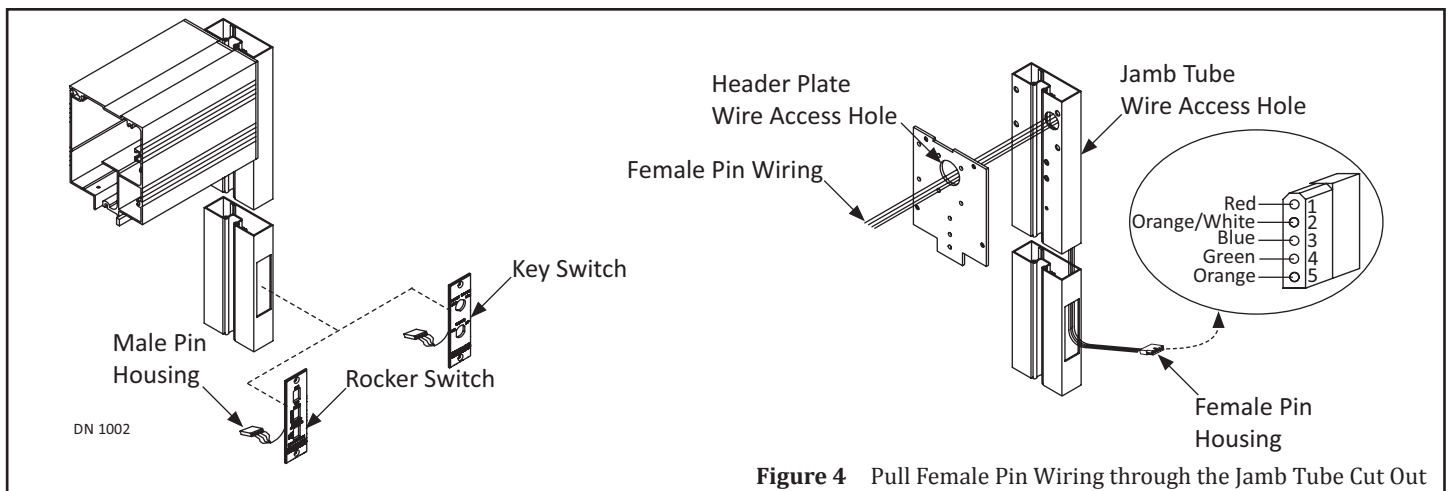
Pull Female Pin Wiring through the Jamb Tube Cut Out
